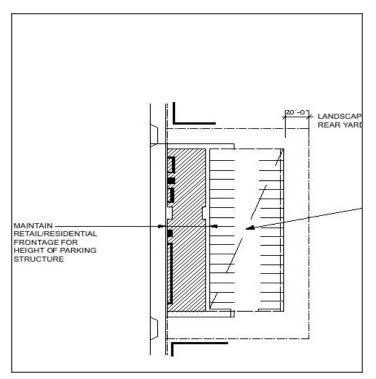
Site plan for intermediate infill site with integrated parking structure. See also photo, Figure 8.3
